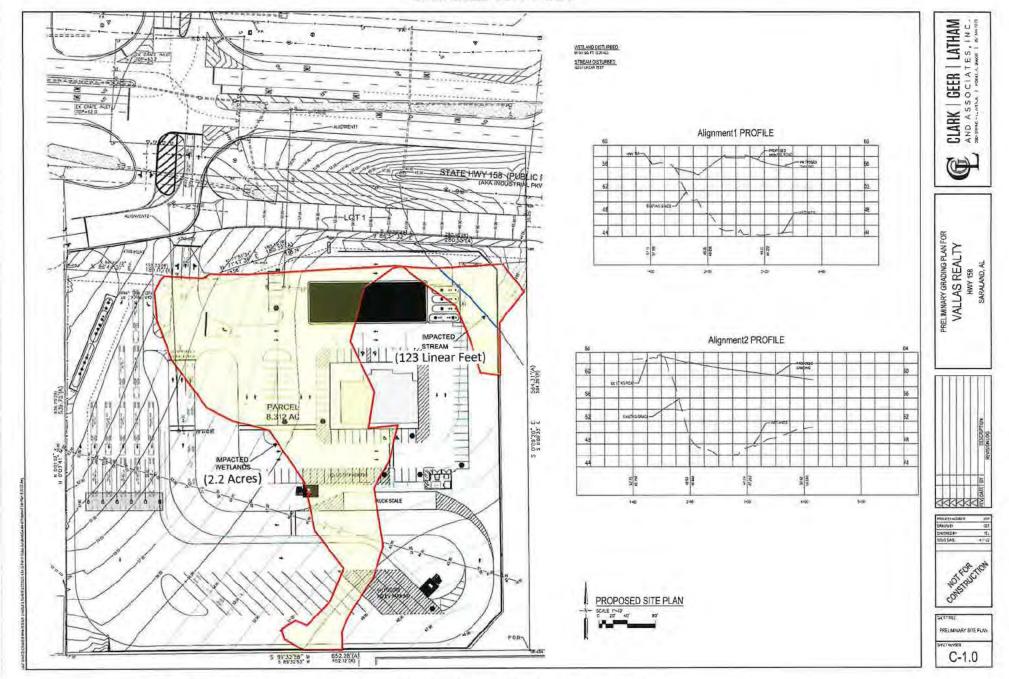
Wetland and Stream Impacts of the Applicant's Preferred Project Plan
